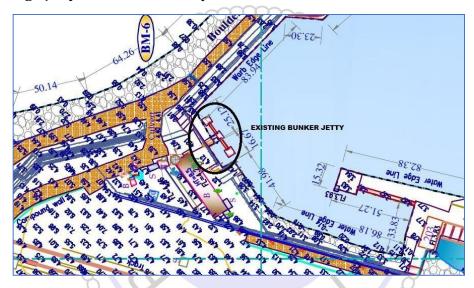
Location and Layout of the Existing Bunker Jetty
